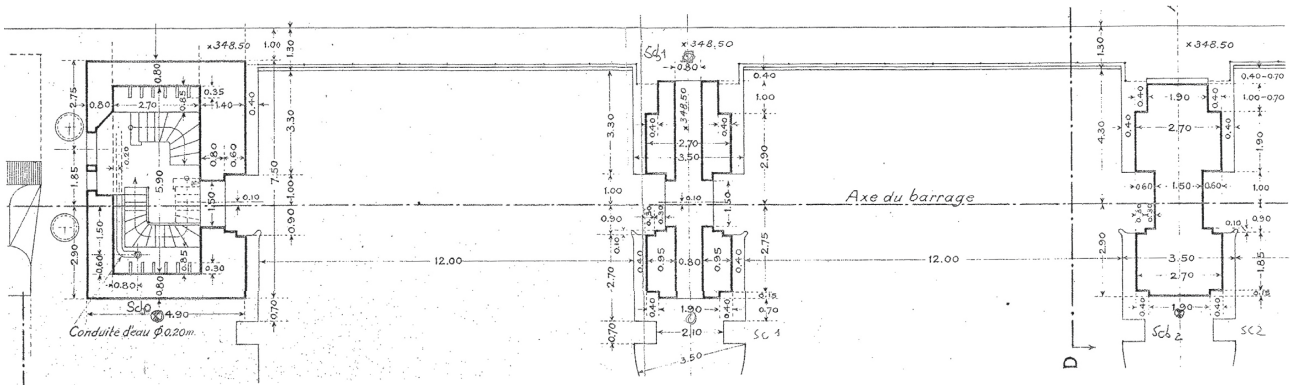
Cross sections of the cable tower, the “elephant feet” at the base, and the plain section of the piers (from left to right).
